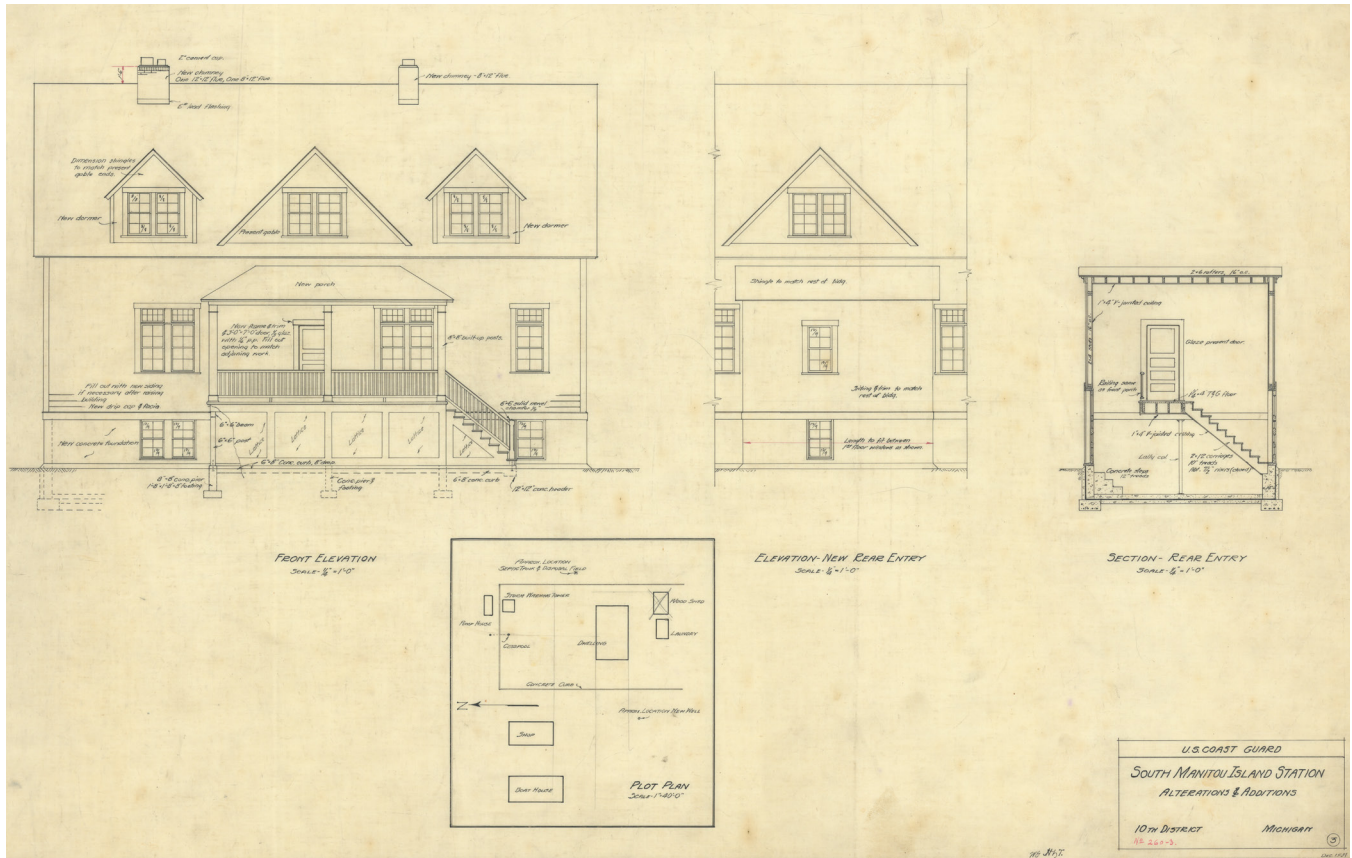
Plans for alternations and additions to modernize the Station Dwelling, 1932 (source: National Archives).
